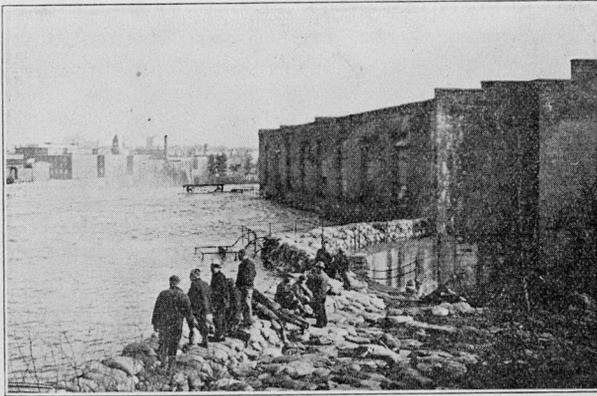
BUILDING SANDBAG DAM TO PROTECT POWER HOUSE AT AMOSKEAG DAM, MANCHESTER, N. H.
